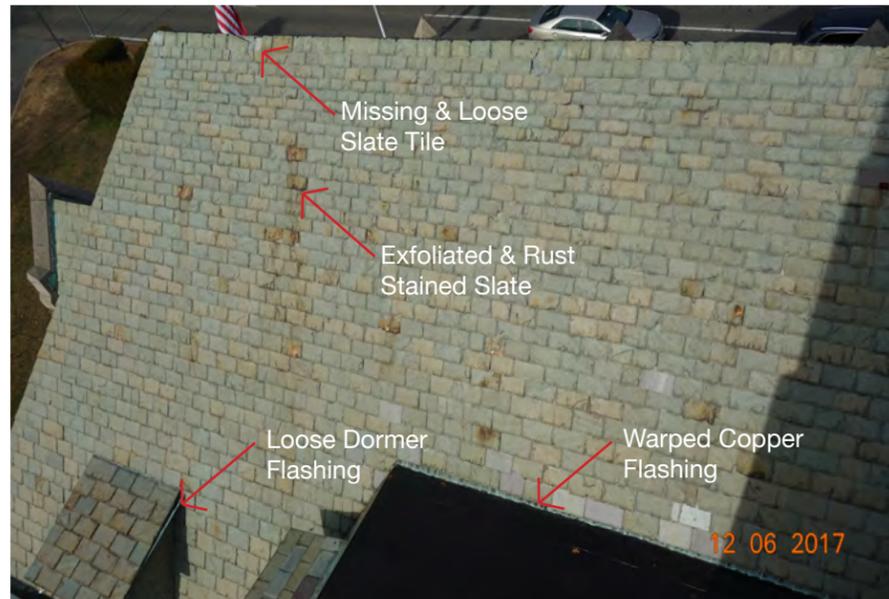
1 Slate Hip Roof, Dormer & Copper Flashing
